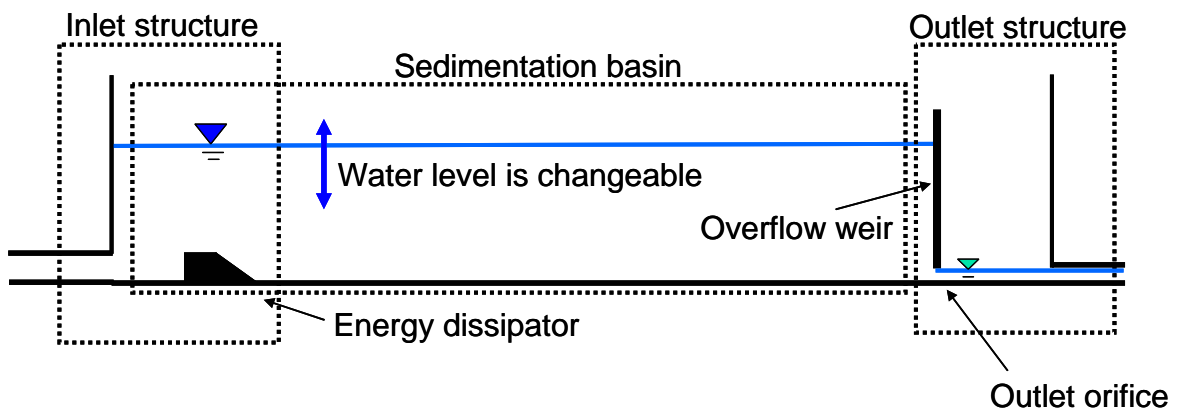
Design schematic for box culvert type stormwater sedimentation basin
